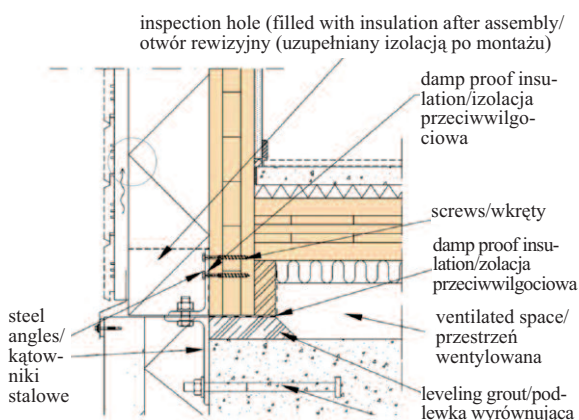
Detail of the CLT module connection to the foundation using a joint made of angle bars [23]
